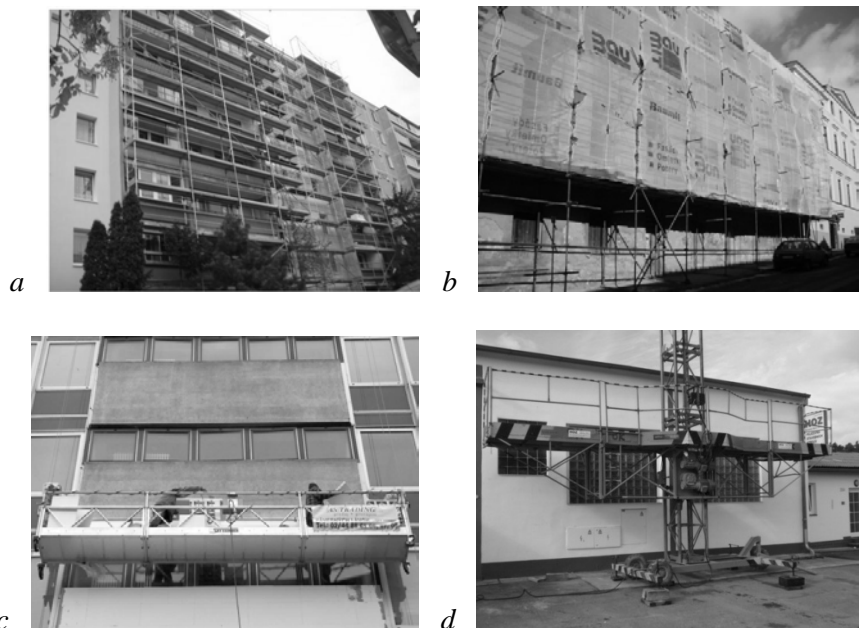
a – scaffolding system SPRINT; b – tubular scaffold TRUSTA; c – suspended platforms STROS 0; d – work platforms STROS WP 1000 0
